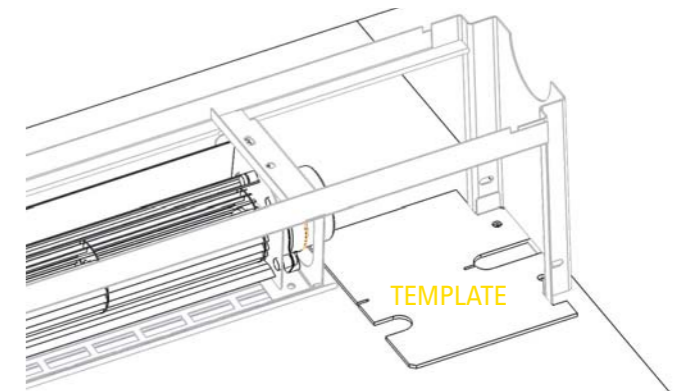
Remove the convector cover, including its plastic parts and grille. Adjust the convector in the required position. Place the template on the floor at the place of heating water supply / removal as shown in the picture. Mark the holes for convector fixing in the floor.
